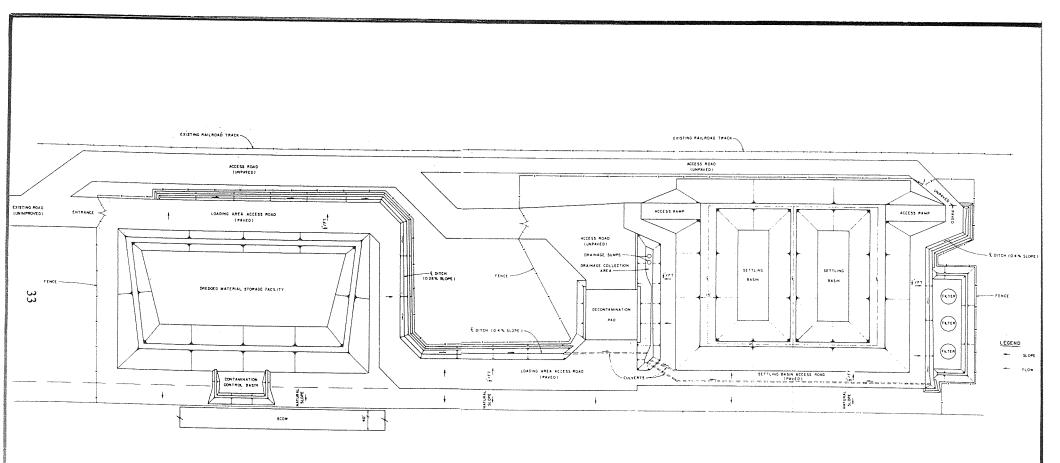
A : Conceptual (Typical) Transfer/Dewatering Site Facilities Operational Systems Layout.
